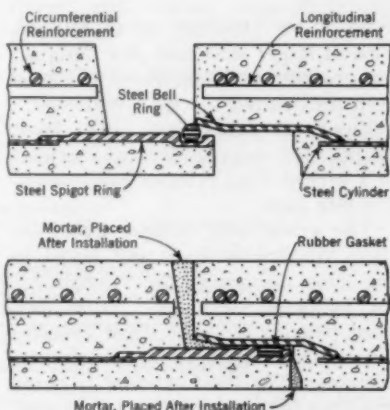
Cross Section of Nonprestressed-Concrete Cylinder Pipe and Joint
